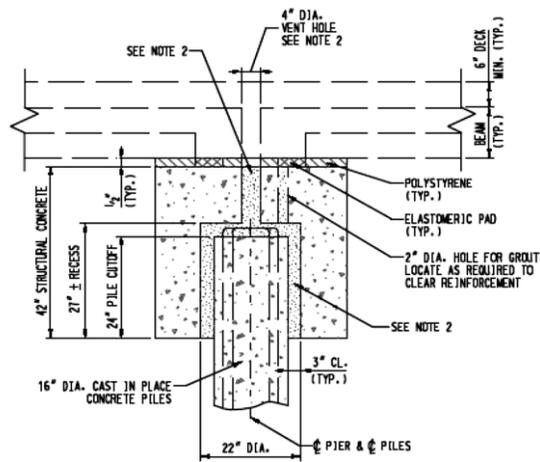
Field Application of Cap Beam Pocket Connections in Texas (Brenes et al., 2006)
